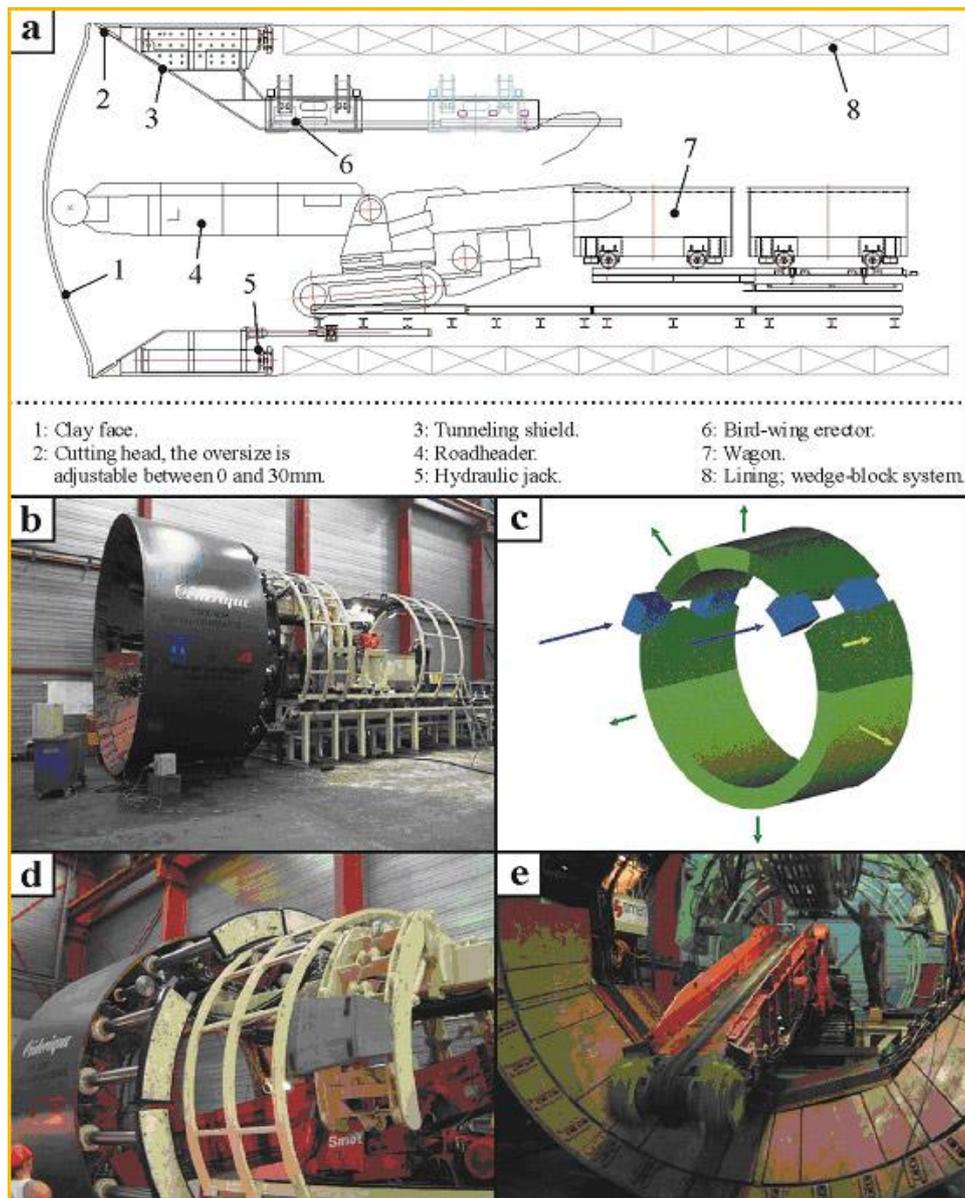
General design of the excavation technique; a) schematic view of the tunnelling equipment, b) the same equipment during an on-surface test assembly, c) the wedge-block principle, d) hydraulic jacks and bird-wing erector, e) adjustable cutting head and roadheader.
